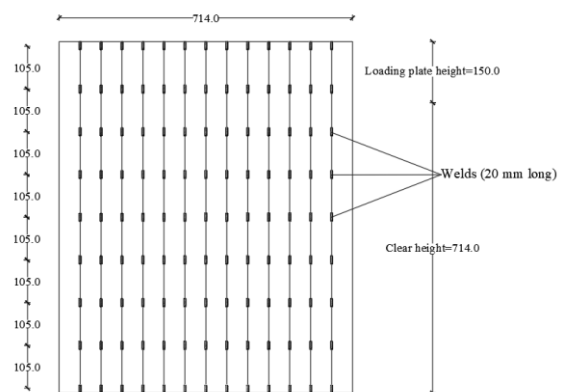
Elevation view A-A with welding details of CFCSW1 (units in mm)
